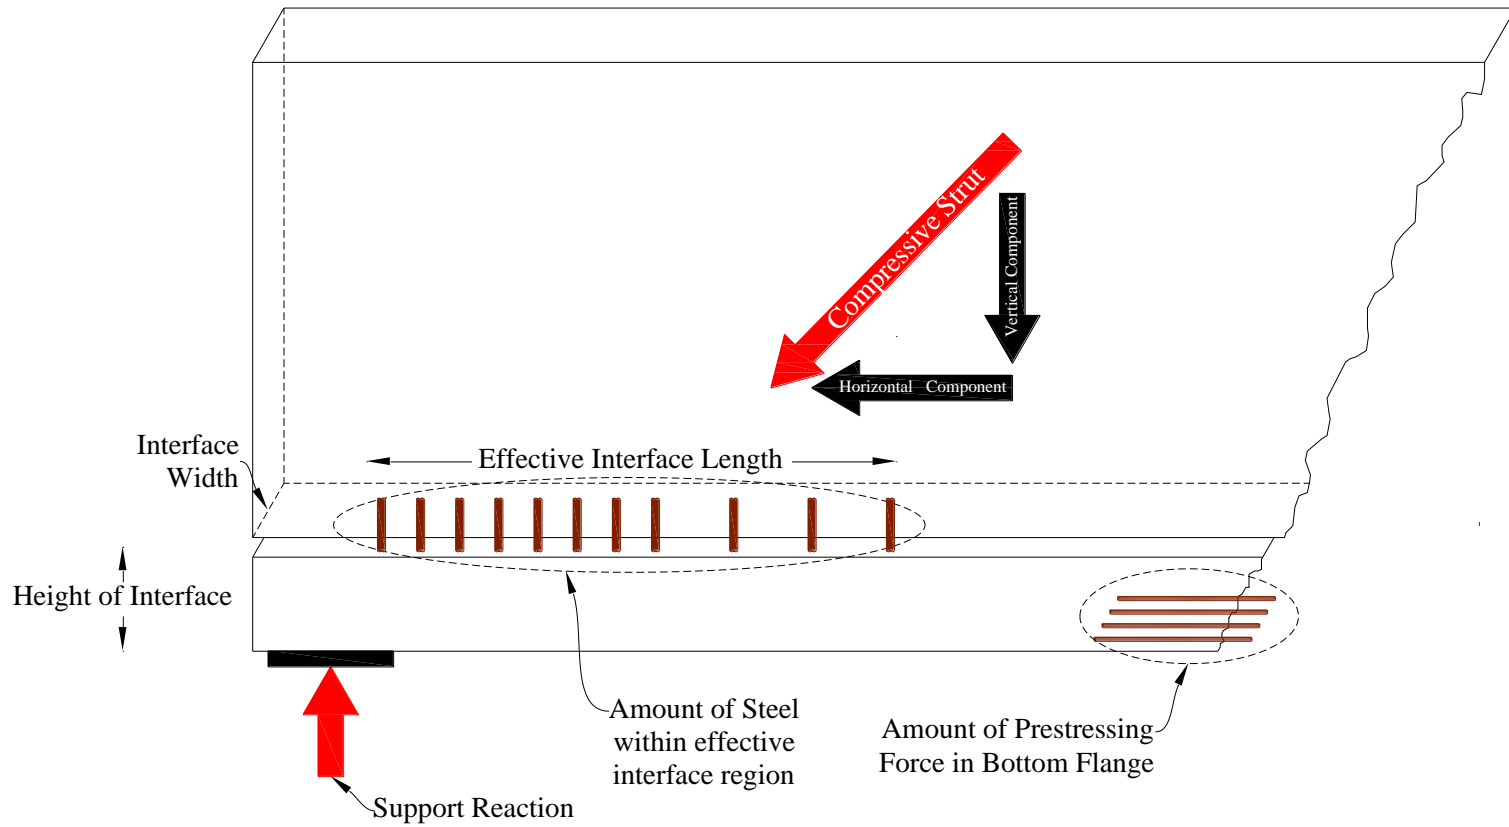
Variables affecting the susceptibility of prestressed concrete beams to failures at the web-to-flange interface
